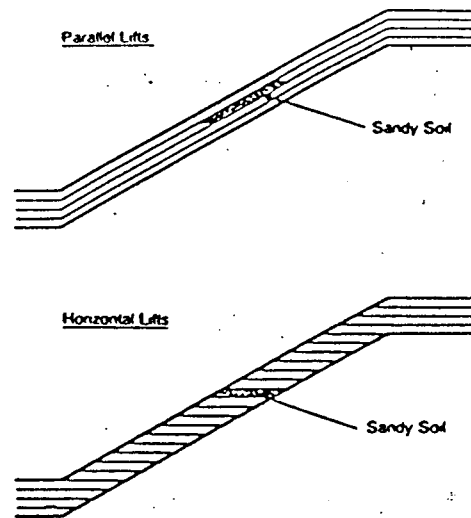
Effect of sandy soil zone on liners with parallel and horizontal lifts.
